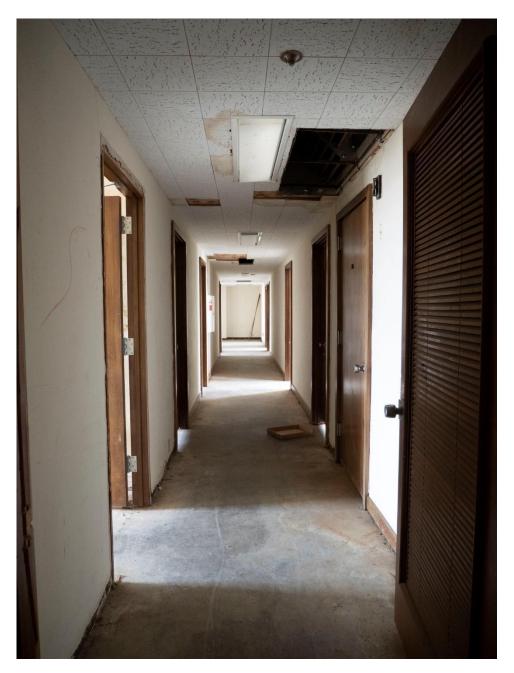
First Wichita National Bank 12th floor office space. View southwest.
